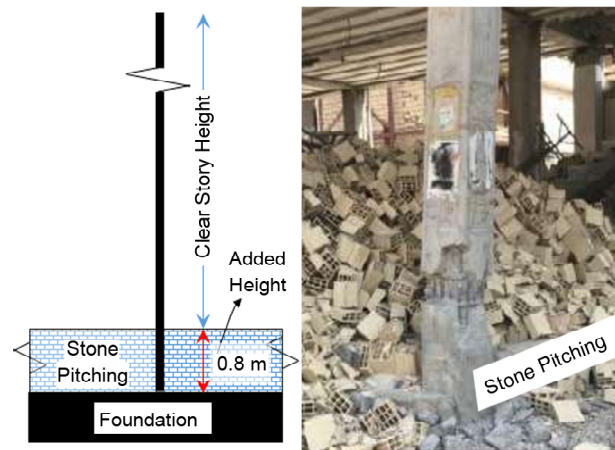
Example of column elongation used instead of foundation elevation to upgrade the building floor.
